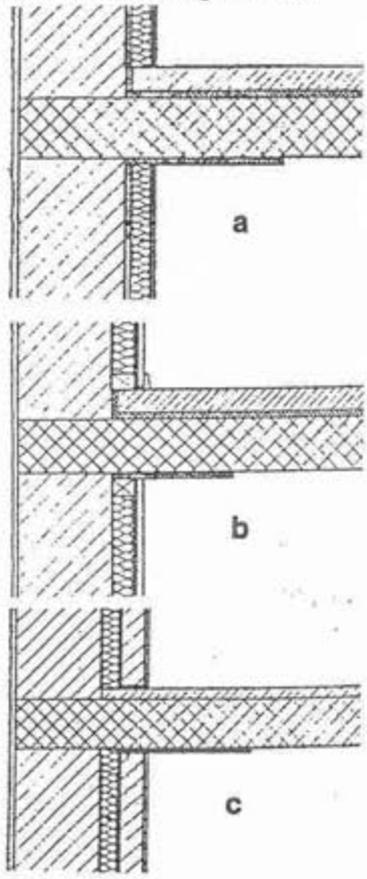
Retrofit internal thermal insulation, a) a sandwich panel: plasterboard+foam+plasterboard b) foam on wall+rigid sheet cover c) light masonry protective layer
